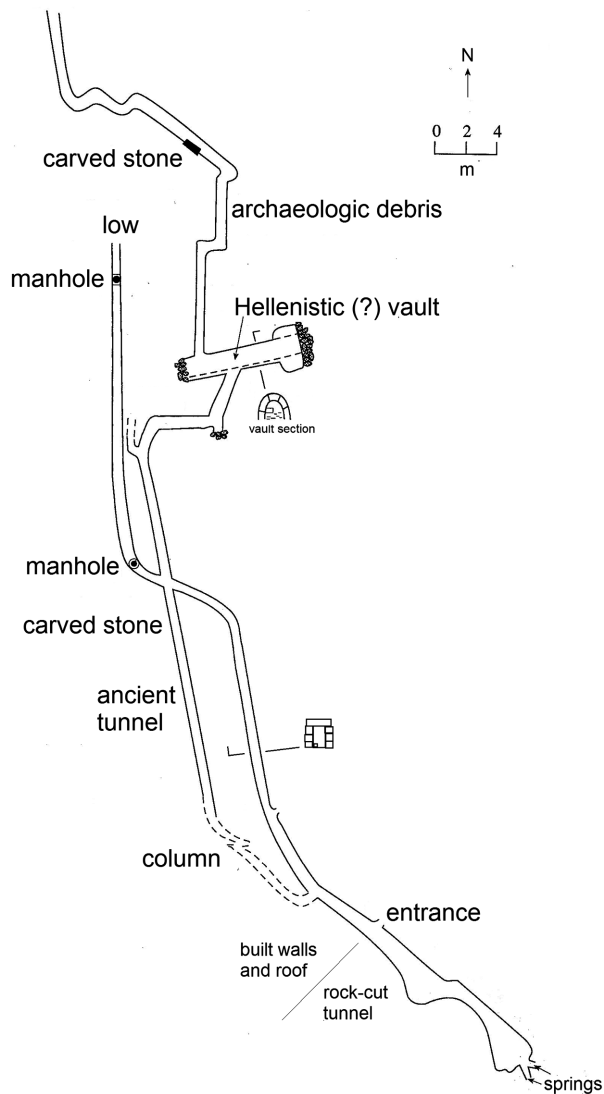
Plan of 'Ein Qaryun tunnel system, probable site of initial Hellenistic settlement of Ma'abarta, surveyed by the author. A short rock-cut tunnel drains the water from the spring point to masonry built tunnels, partly with a bedrock bottom
